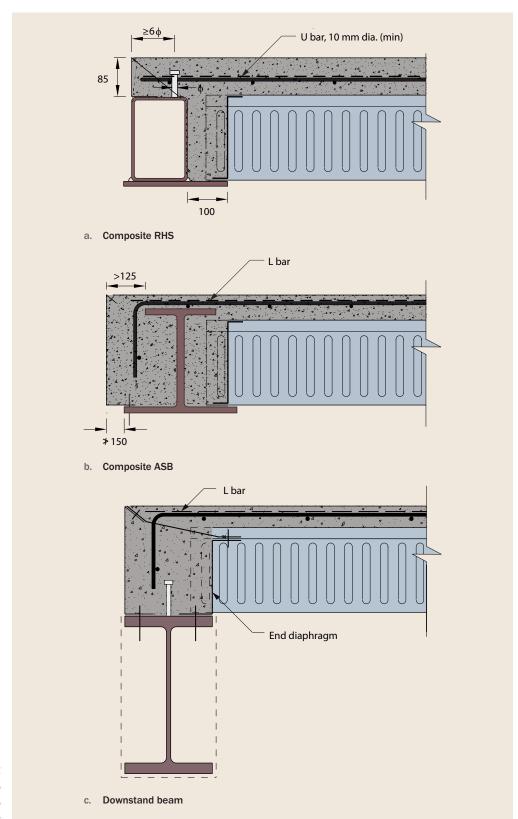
Typical anchorage provision in edge beams with Slimdek
